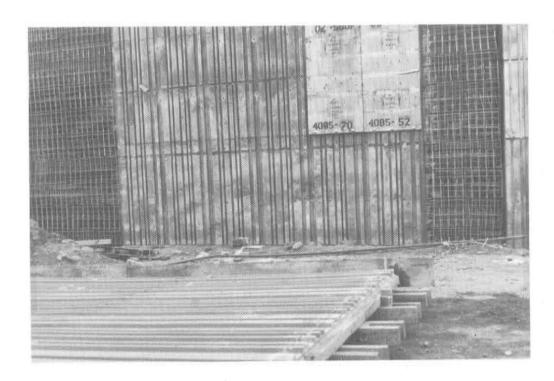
Rubber and Wood Forms Used to Attain Specified Rustication.
